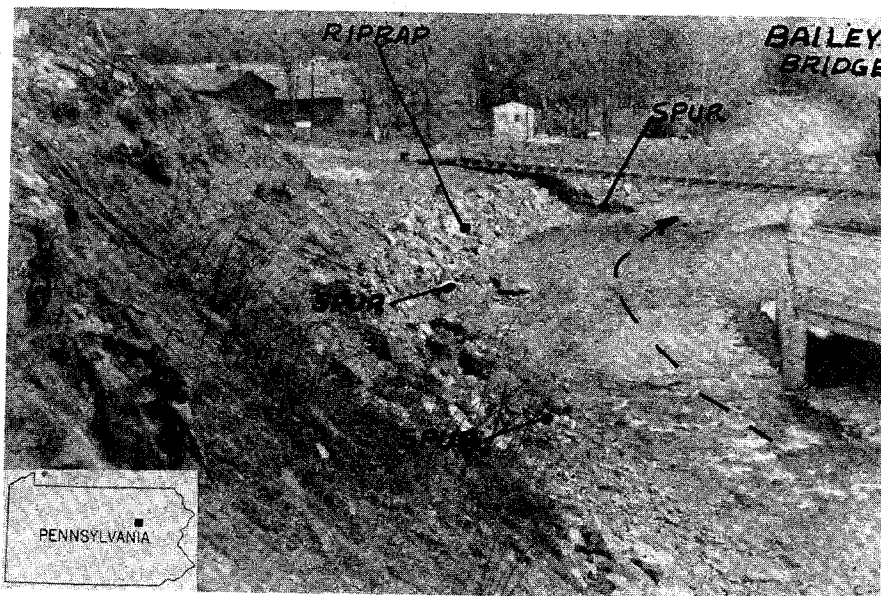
Upstream view of West Branch Fishing Creek in 1976, showing Bailey bridge, rock spurs, and riprapped right bank.
